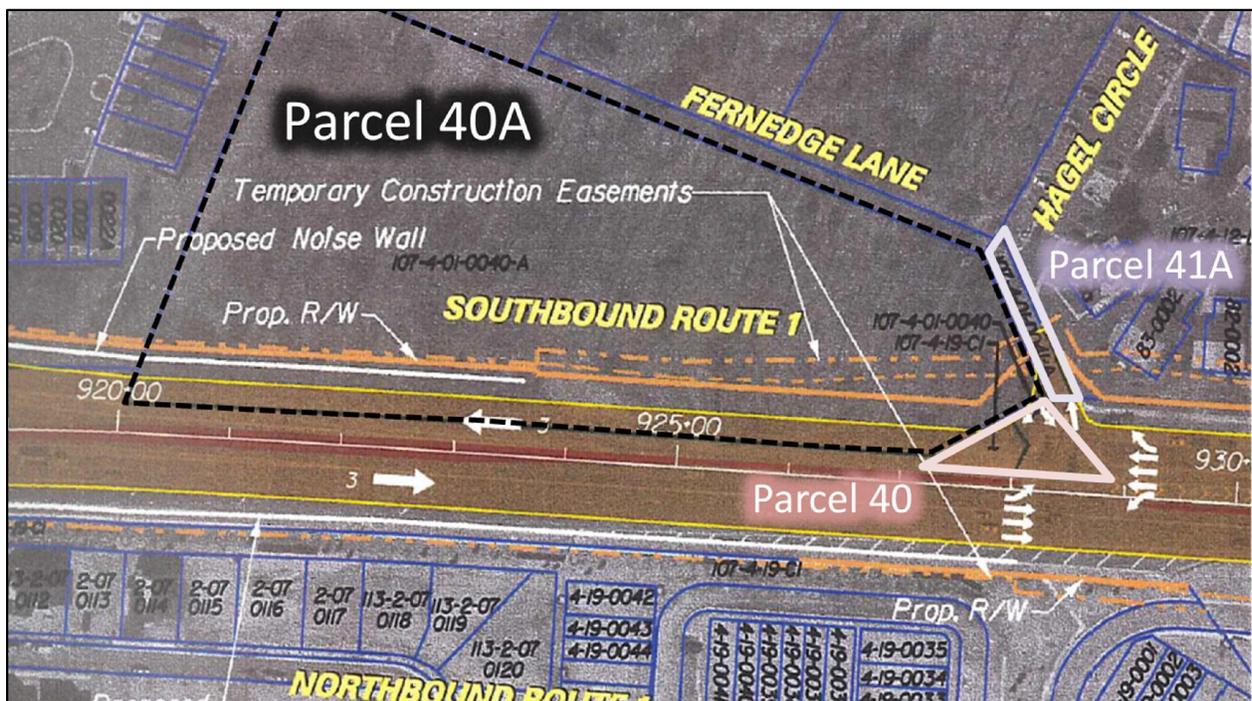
Sheet 26.1 of the Route 1 Location Study, with Parcels 40A, 40, and 41A outlined for clarity purposes by DPZ staff (Source: Virginia Department of Transportation)
